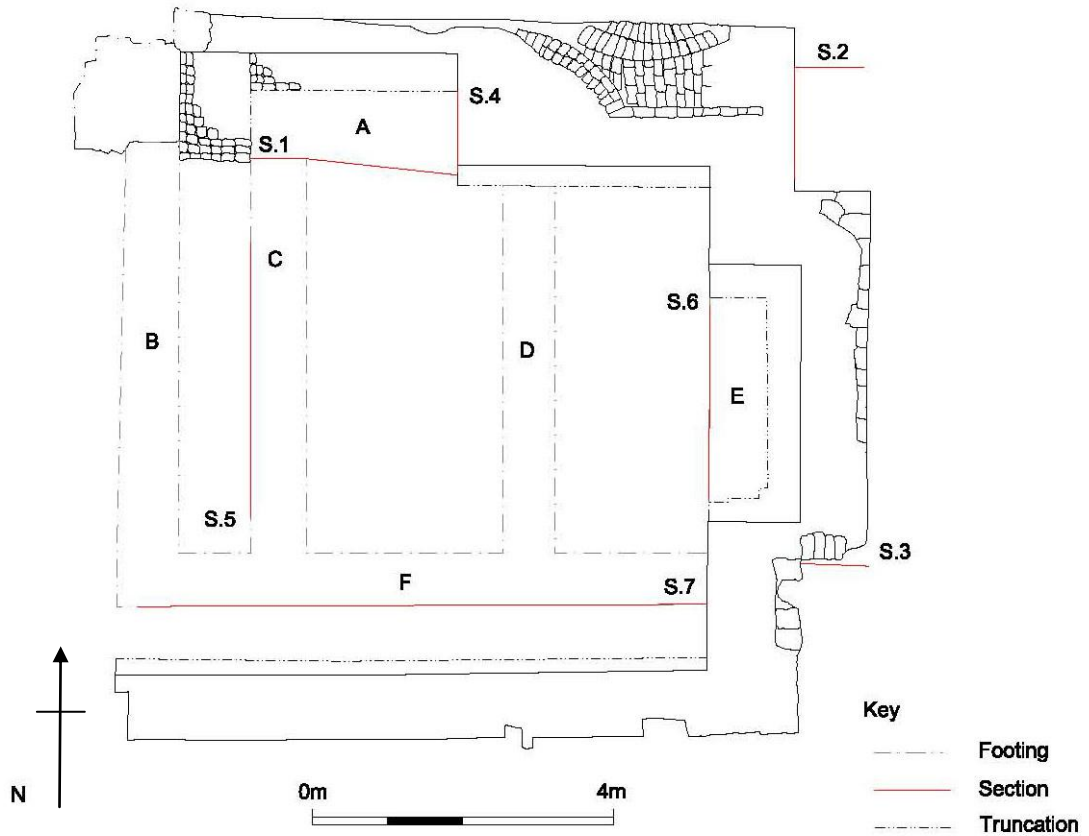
Wall and footings (A-F) plan with section locations (scale 1:100)
